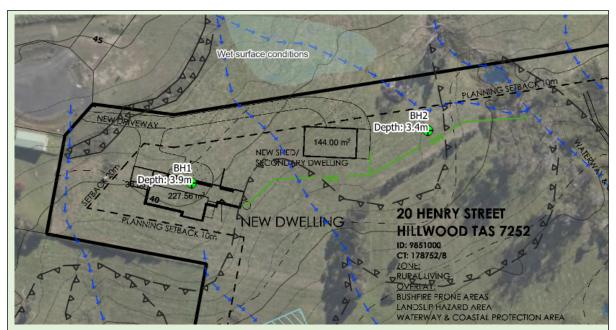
excerpt from stormwater management plan, showing the stormwater being directed East, away from 14 Henry Street.
